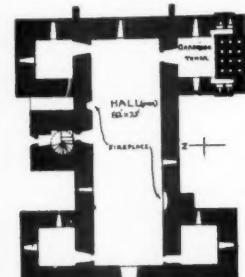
A plan of the ground floor of Langley Castle, Northumberland.
